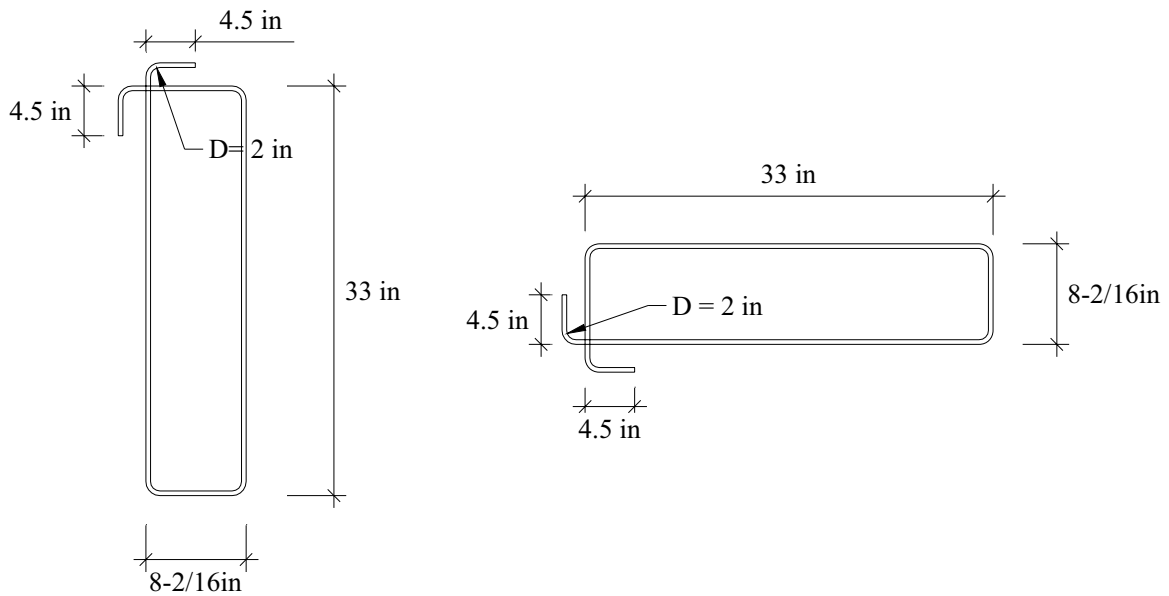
Section B-B; Cross Ties (A) #4 Details; Specimens G1 & G2
